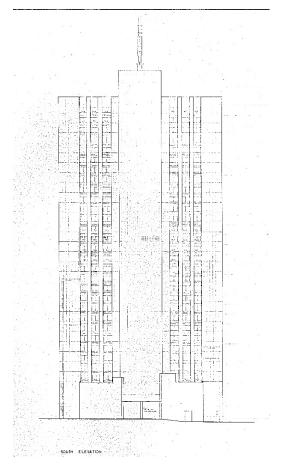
Architectural drawing of the south elevation, dated 1969 (BAP).
